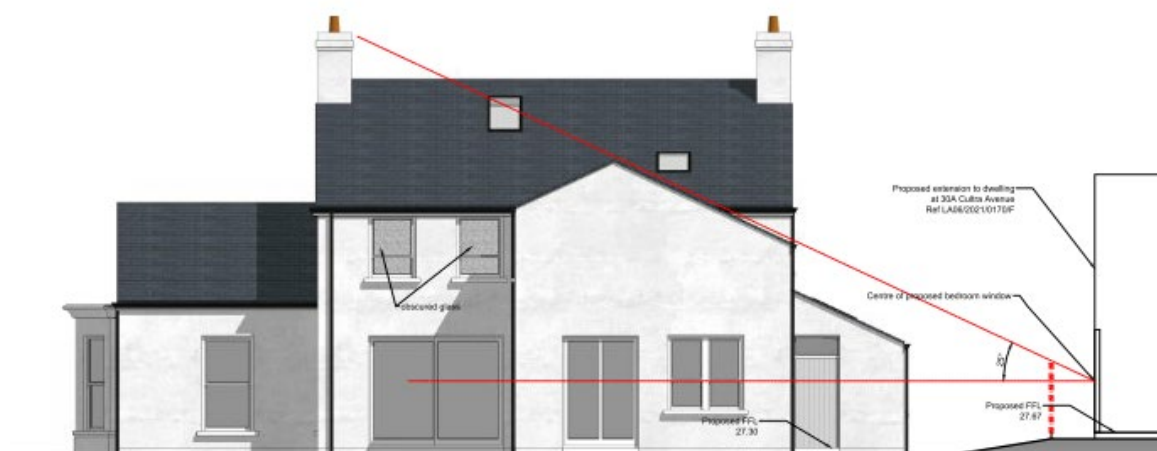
Light test for bedroom window to 30A Cultra Avenue on South-east Elevation of House Type B as initially proposed (extract Drg 5).
